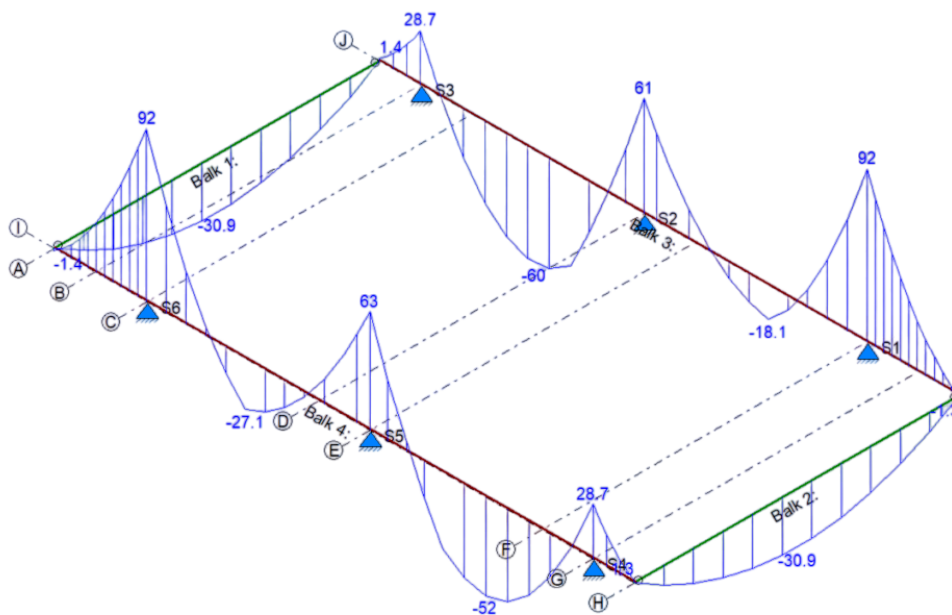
Moment distribution on prefab concrete foundation beams/piles
